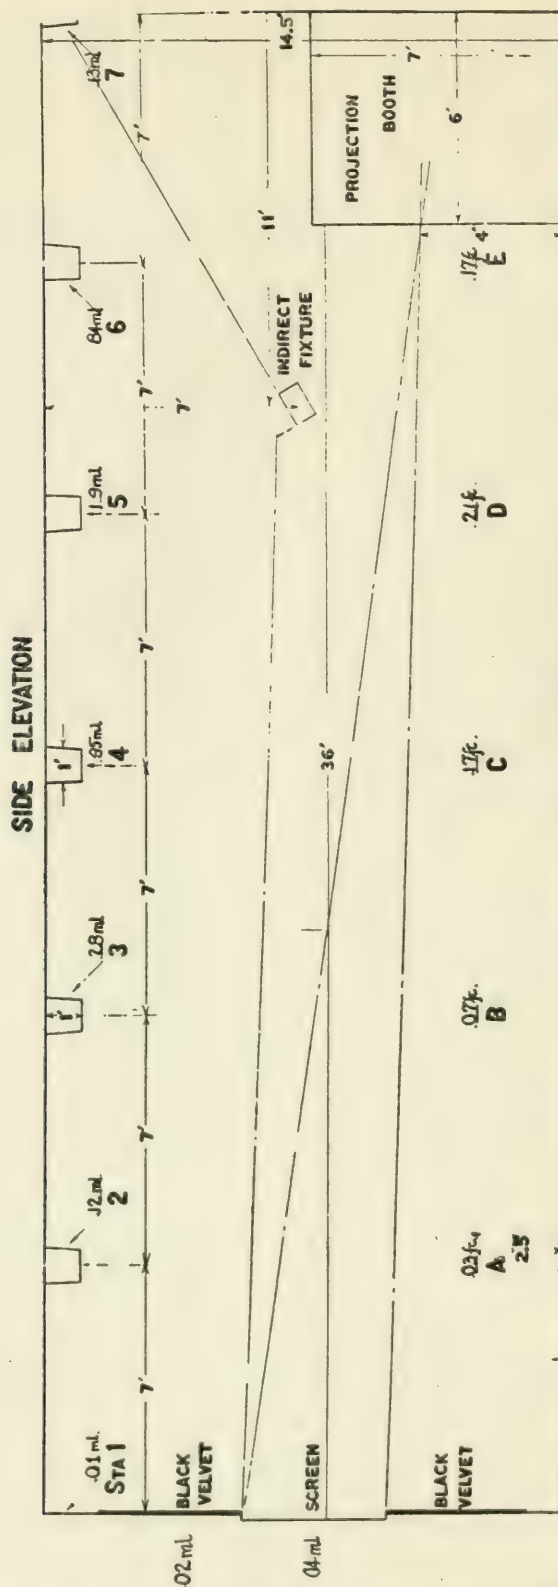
Data obtained with the second arrangement of the lighting fixture. (Group I-B.)
